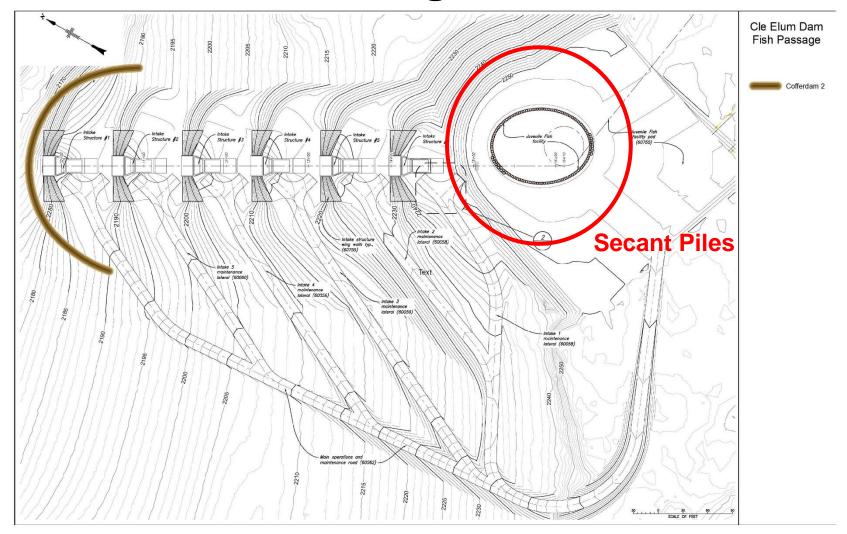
Juvenile Facility Intake Structure, O&M Roads, and Cofferdam #2
